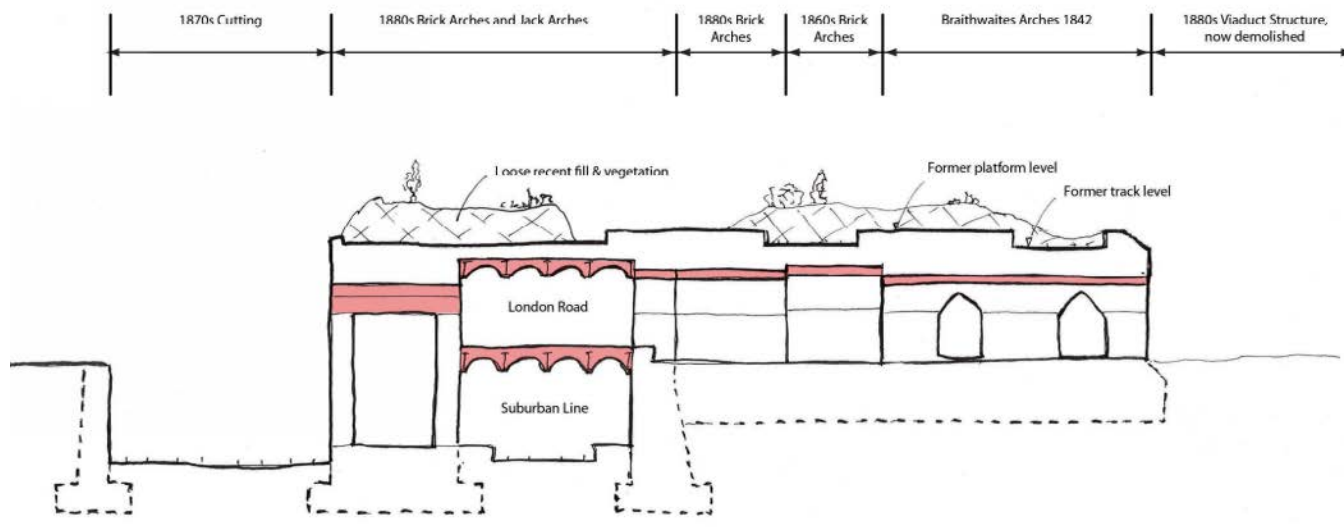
Typical section through Viaduct (east of Wheler Street)
